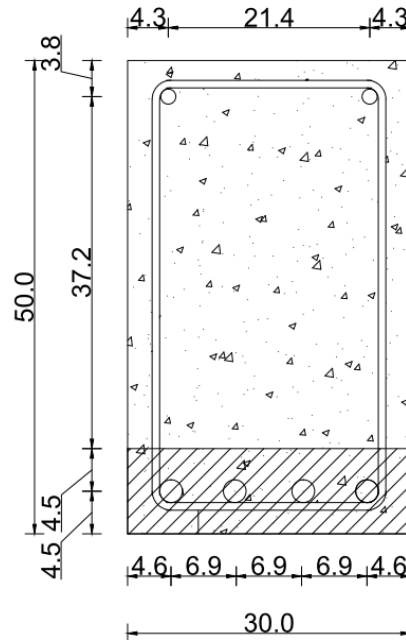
Proposed effective reinforced concrete section in the tension zone
